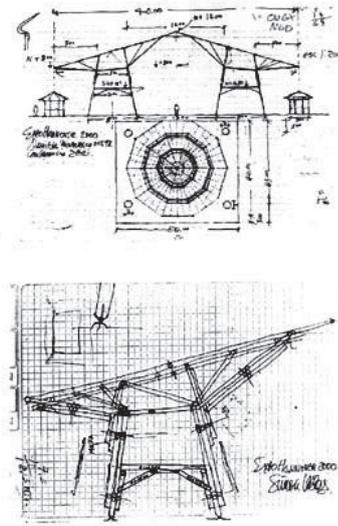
Sketch Section and Plan of ZERI Pavilion
